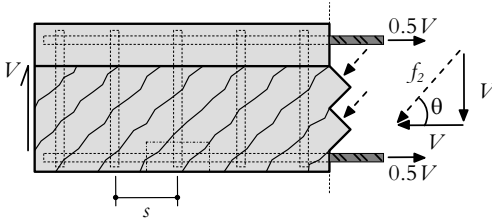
Reinforced concrete beam with symmetrical reinforcement subjected to shear.
